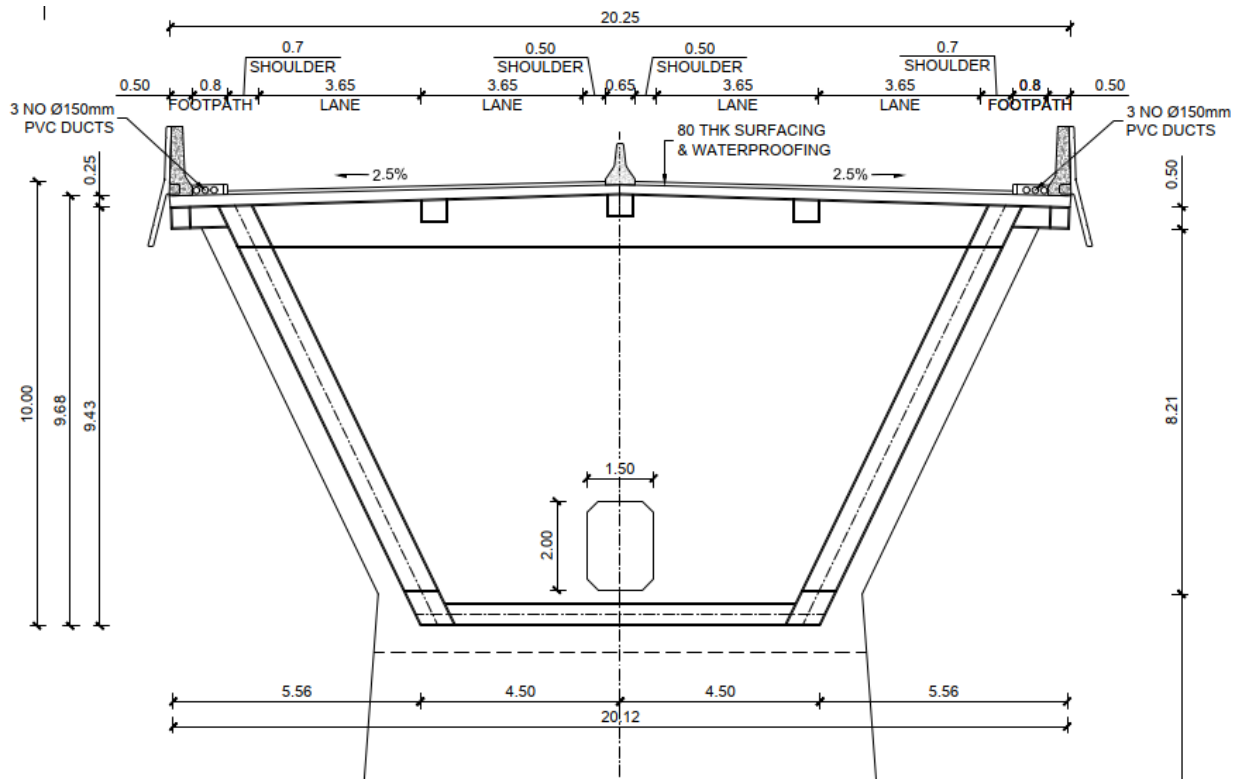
Typical cross section for truss spans over pier (Main span) for Bhola-Lakshmipur.
